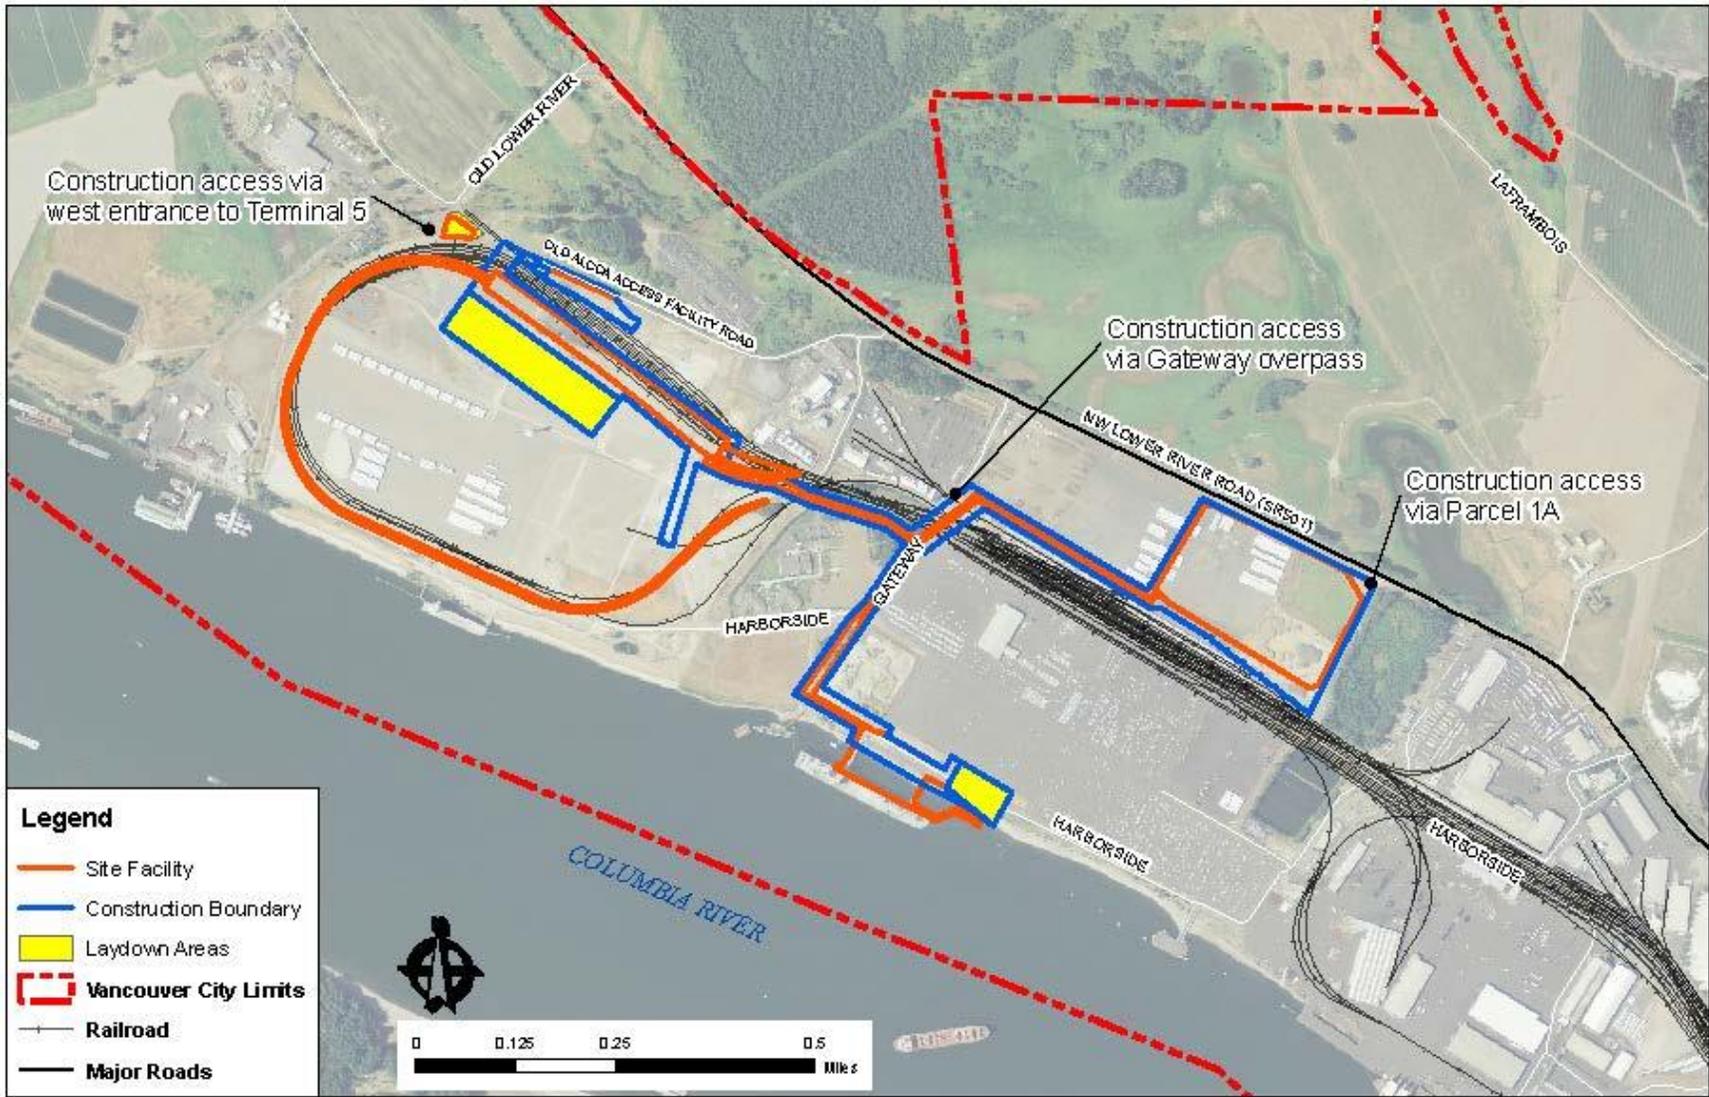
Temporary Construction Boundary and Laydown Areas (Revised)
